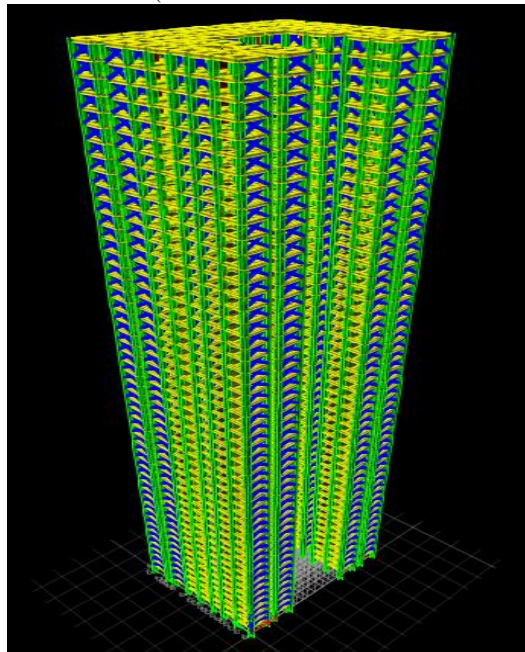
ELEVATION (MODEL NO 2 - BRACED FRAMED STRUCTURE WITH X TYPE BRACINGS)
